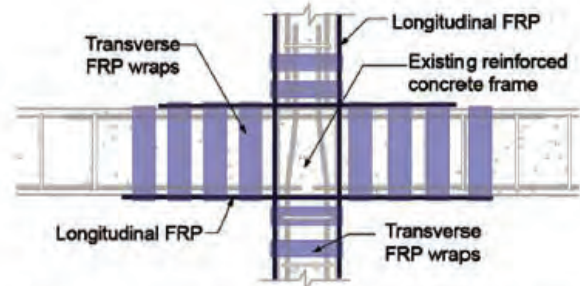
Conceptual FRP strengthening detail (cross section elevation).
